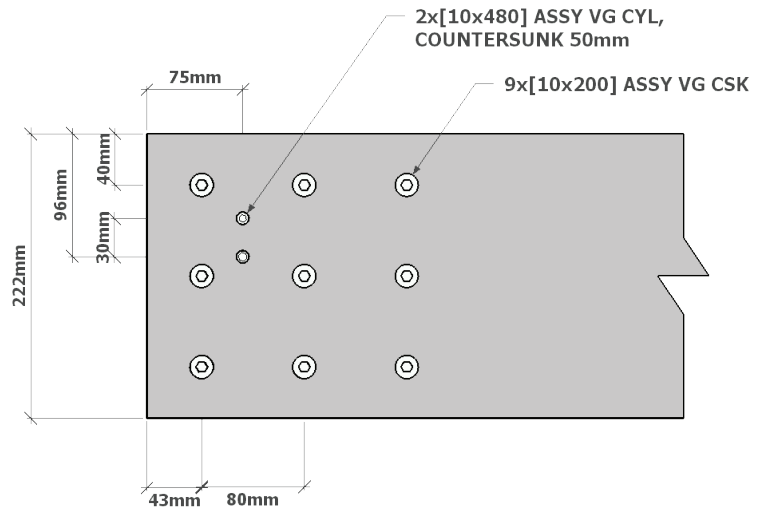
, Geometry of reinforcement screws used for testing on top of secondary beam.
